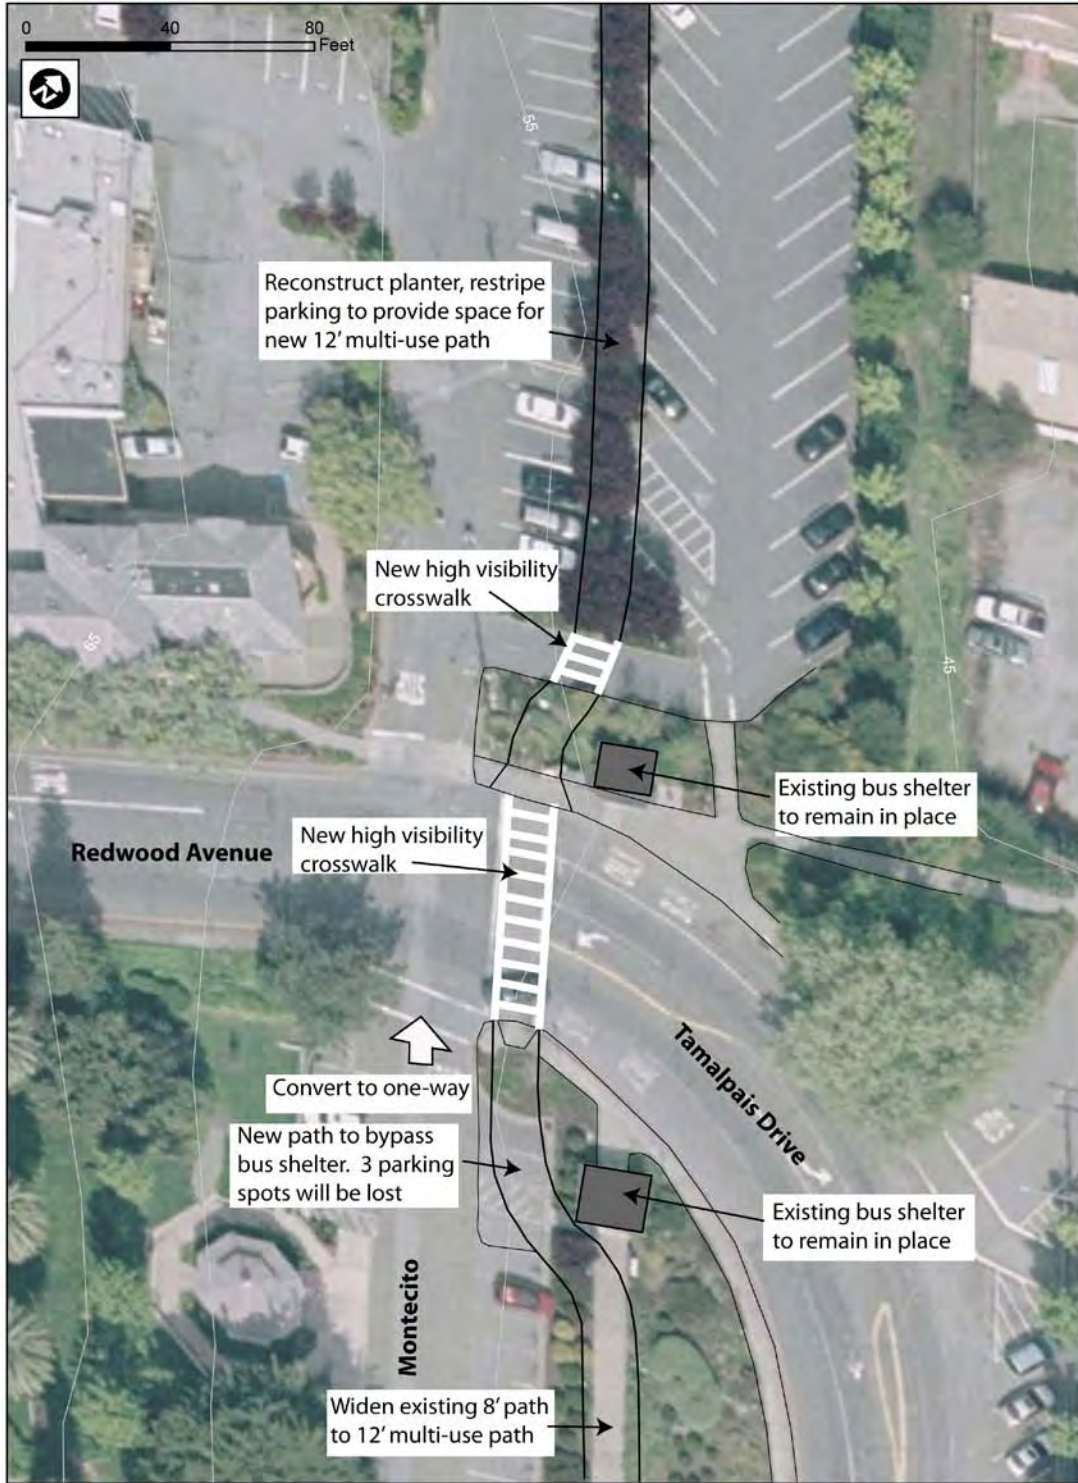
Plan View of Improvements near Redwood/Montecito Intersection
